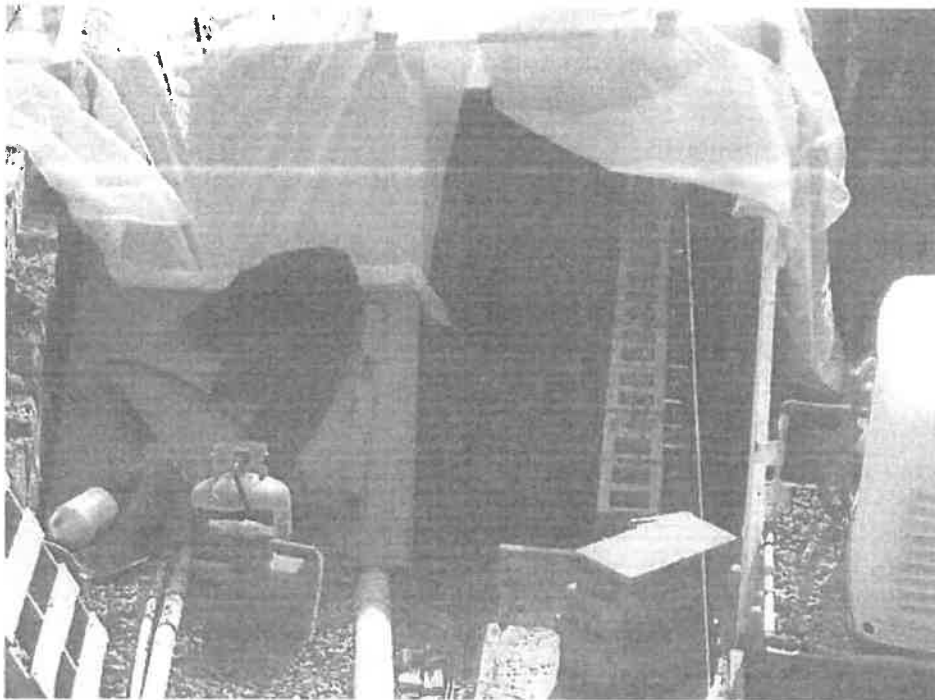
(by others) – View looking south. Concrete masonry block appears to have metal tie connectors at right side. Metal tie connectors are often used to connect stone veneer to CMU walls. Also note there appears to be vertical steel reinforcement inside the CMU vertical cells. Most of the bars are near the center of the core, but some are toward the west side of the cell (which reduces strength).
